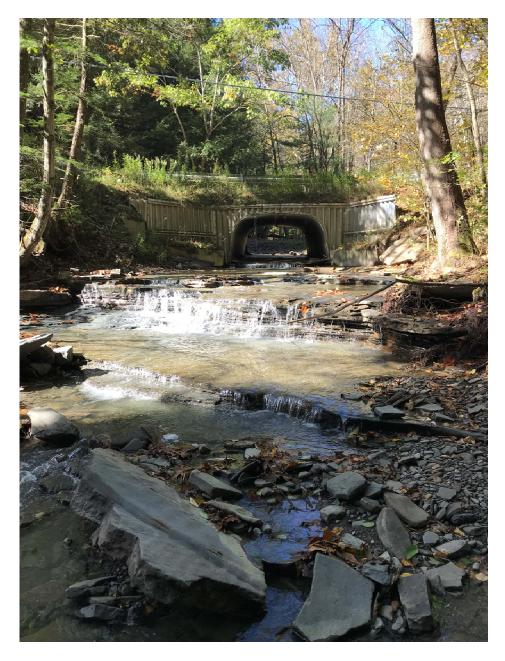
Undersized culvert carrying tributary to the Briggs Hollow drainage beneath State Line Road at WaBH-3400. Photo taken October 17, 2018.
